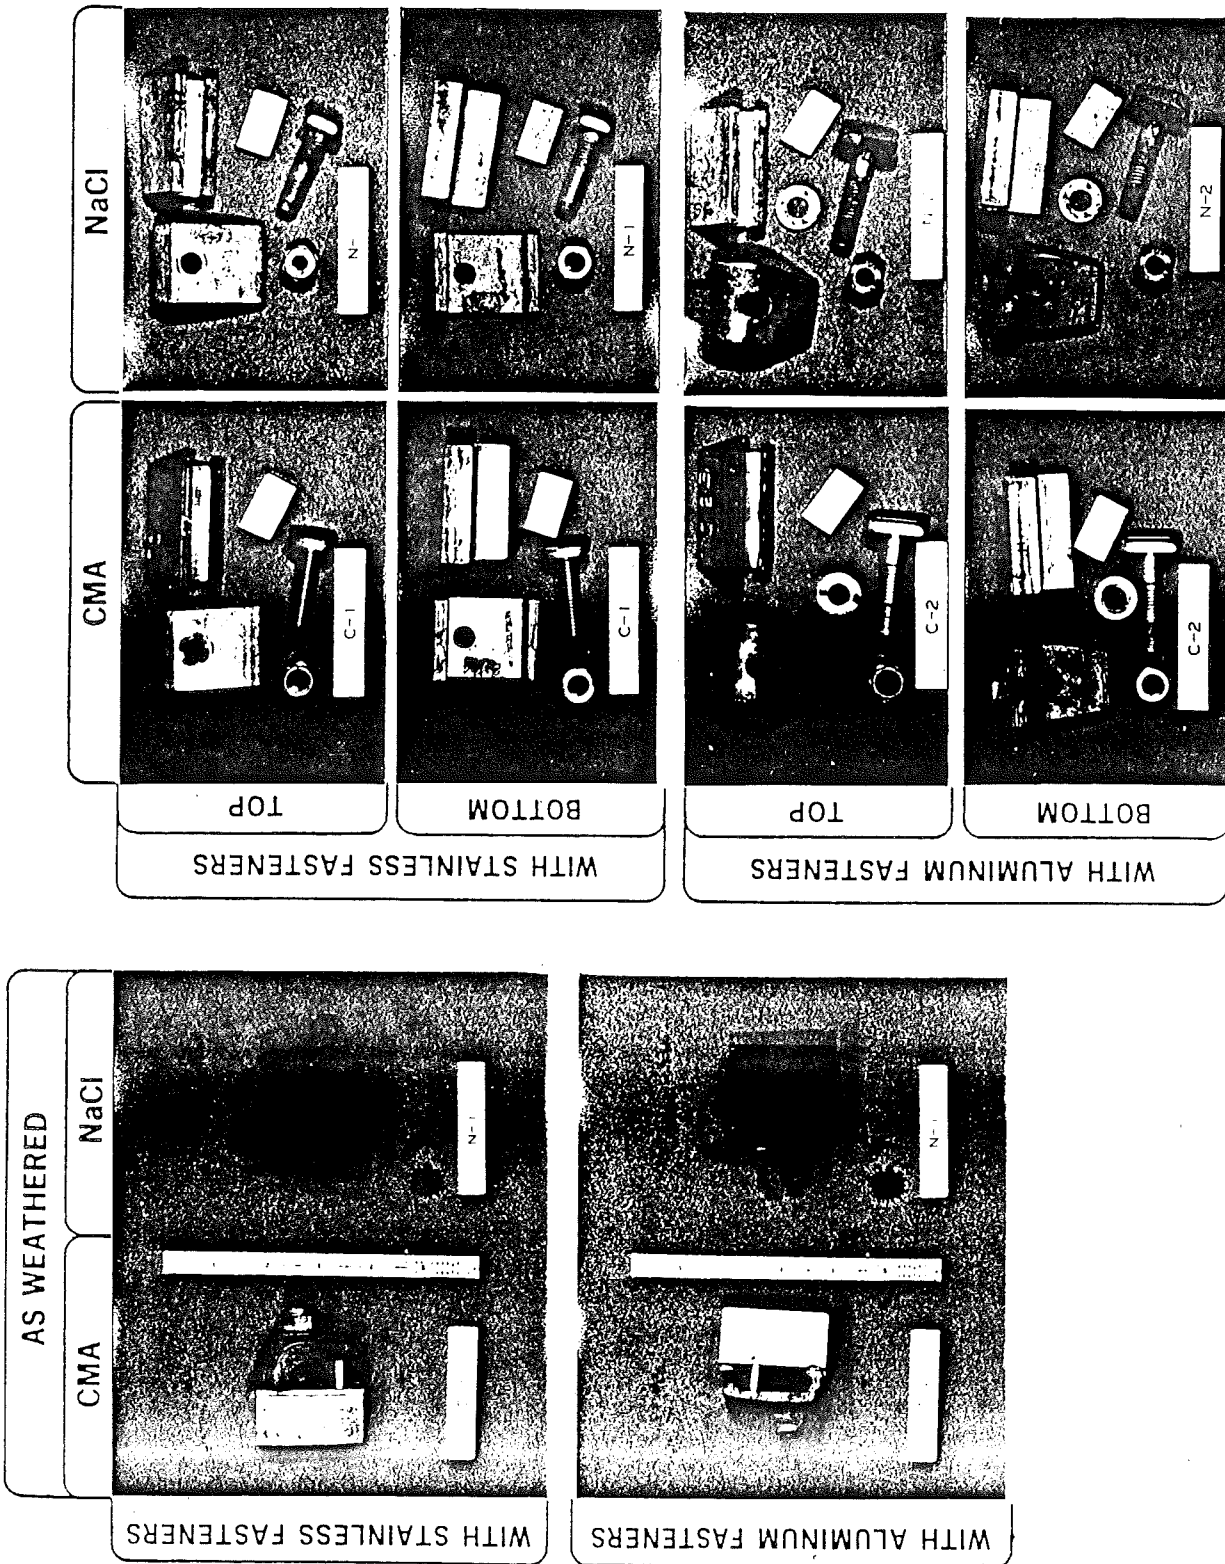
Aluminum sign sheeting with fasteners after three months exposure.
